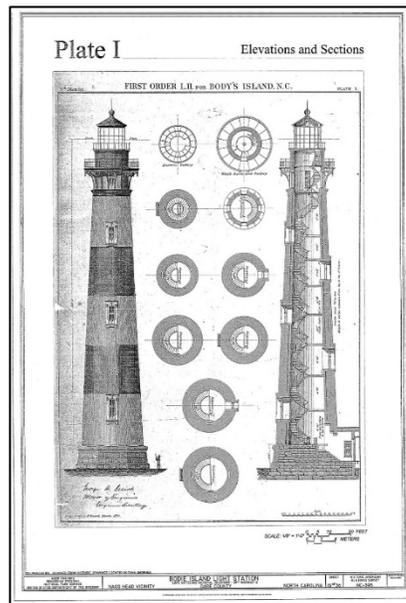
Light tower plan, 1871. (CAHA Collection)
